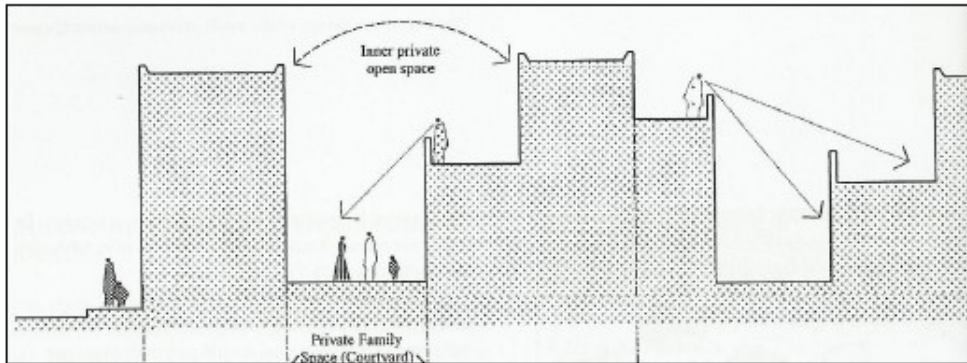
A section through adjoining houses showing how setbacks maintain privacy between them (Source: Edwards et al. 2006).
